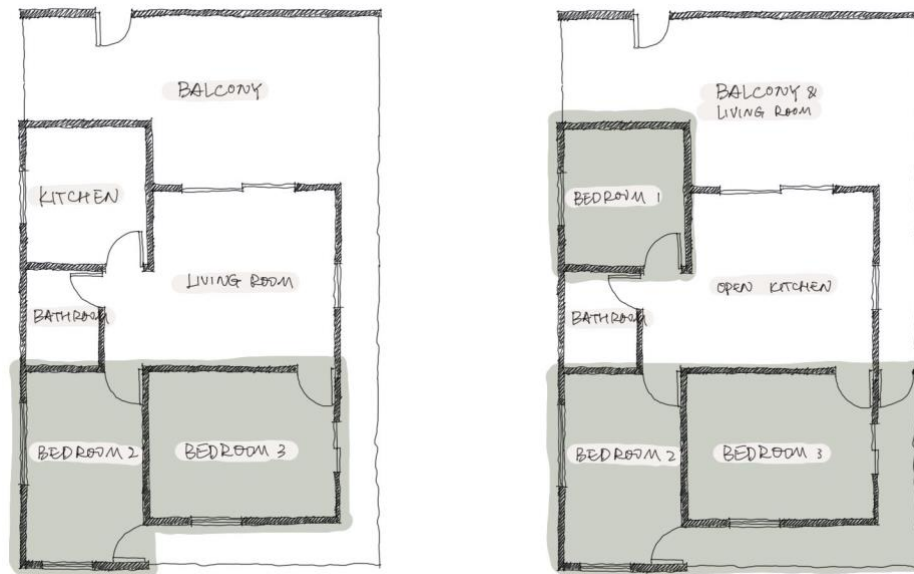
Original (left) and redesigned (right) floor plans of TaiShun Apartment project
